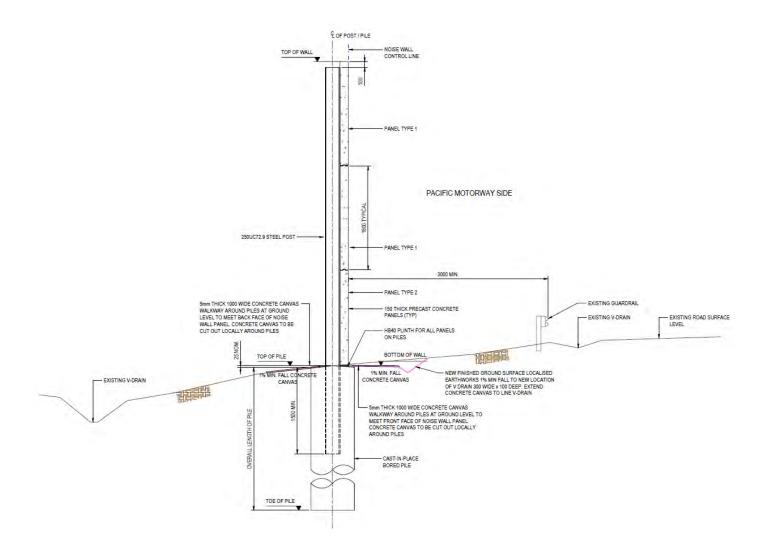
Typical cross section – about 40 metres from the northern end of the proposed noise wall
